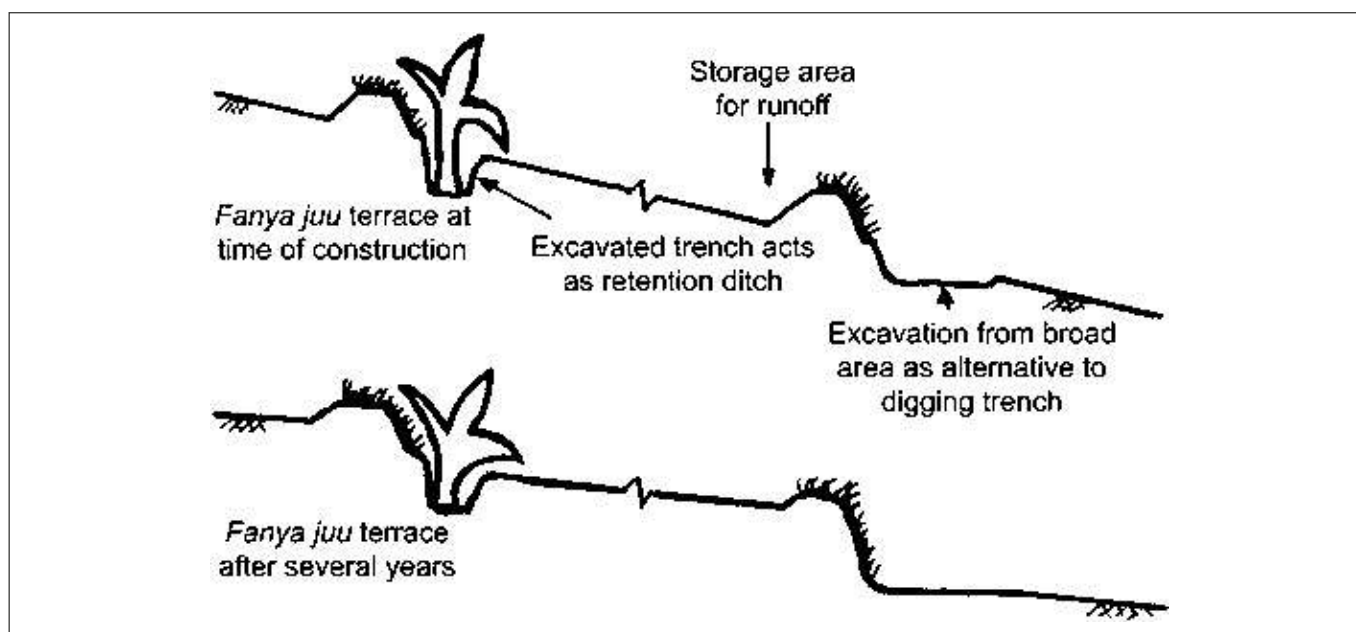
Bananas planted on the lower trench of the Fanya juu terrace
